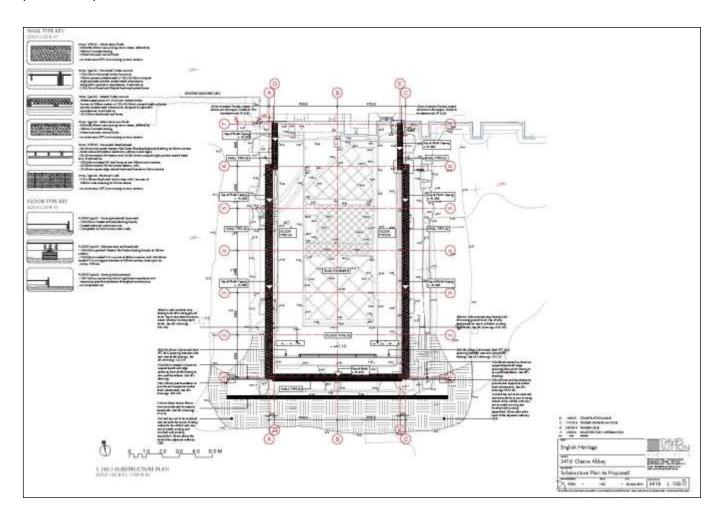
Site plan showing proposed foundation of replacement building (Supplied by Davies Sutton Architects for information – Drawing No. 3418 L 100 D)
